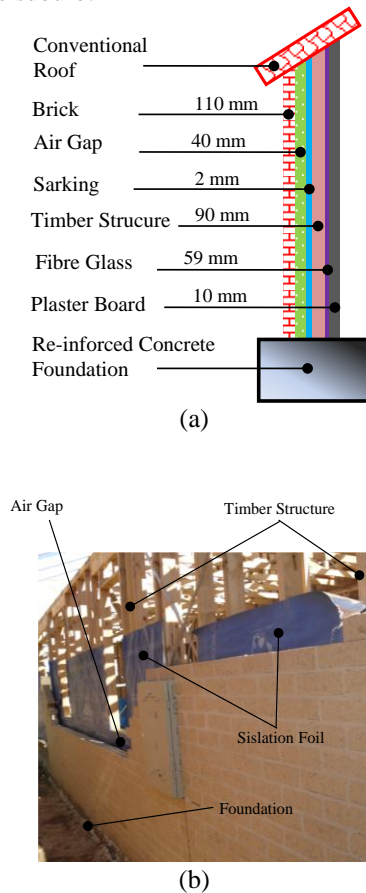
(a) Schematic of house wall; (b) conventional house wall systems near Melbourne
